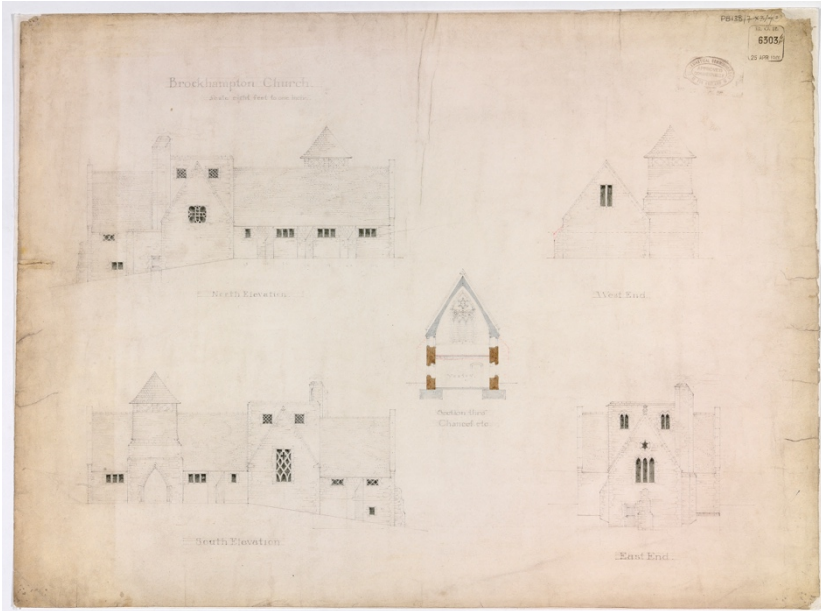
All Saints', Brockhampton, W.R.Lethaby's Elevations and section drawing
